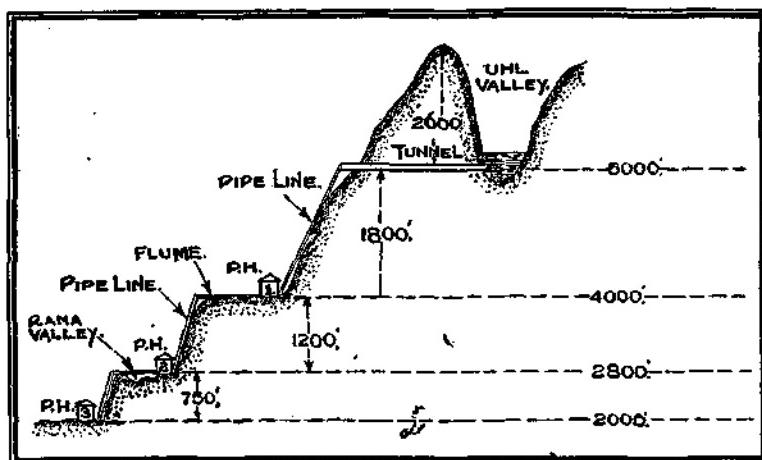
Sectional View, UHL RIVER UNDERTAKING.
